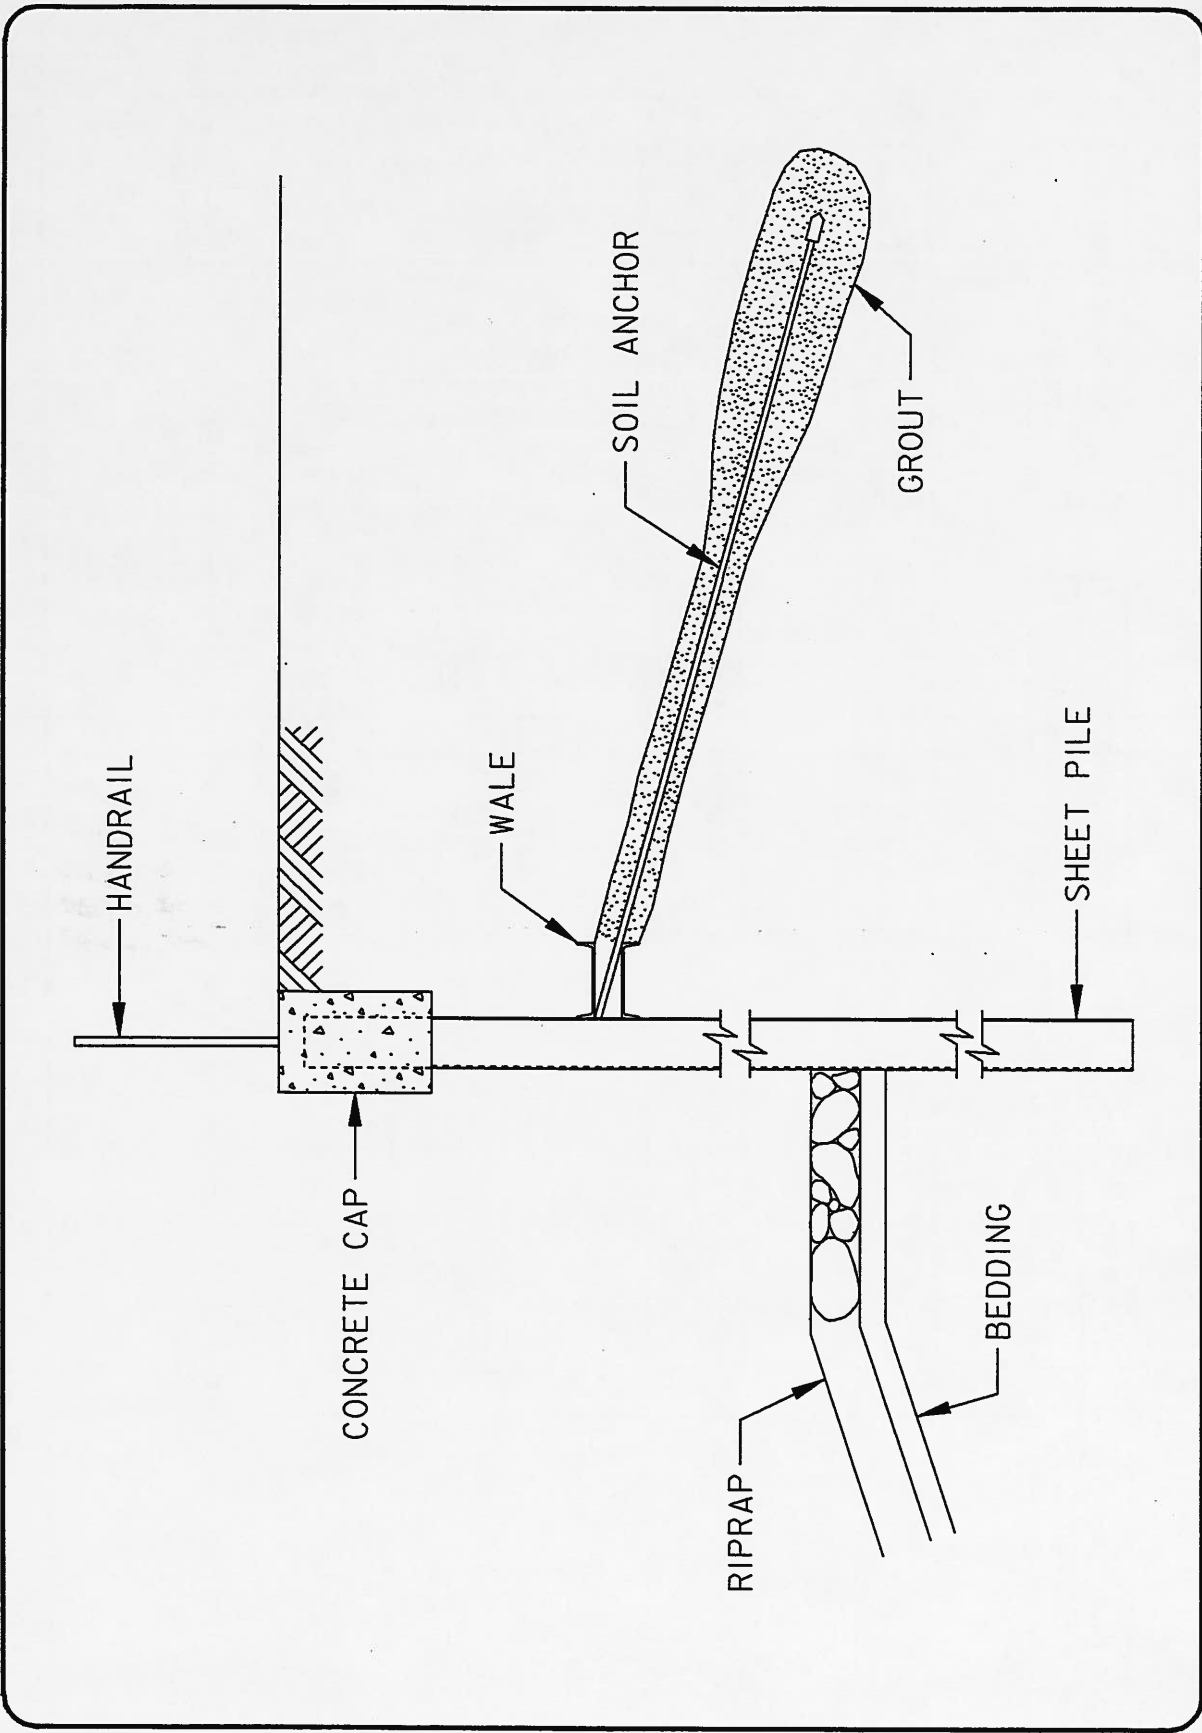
Anchored sheetpile retaining wall proposed in the Stage 2B Feature Design Memorandum
